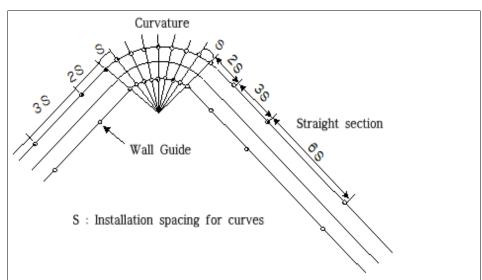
Wall Guide Installation Interval (Connection Section between Straight Line and Circular Curve)
